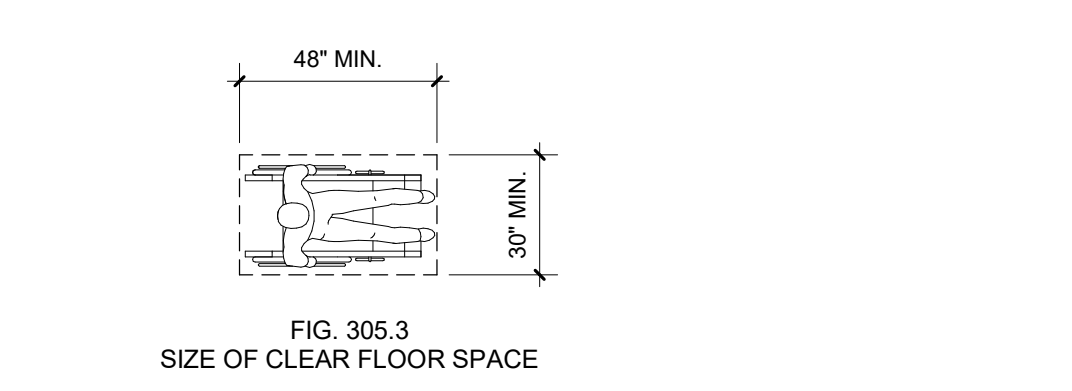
SIZE OF CLEAR FLOOR SPACE
